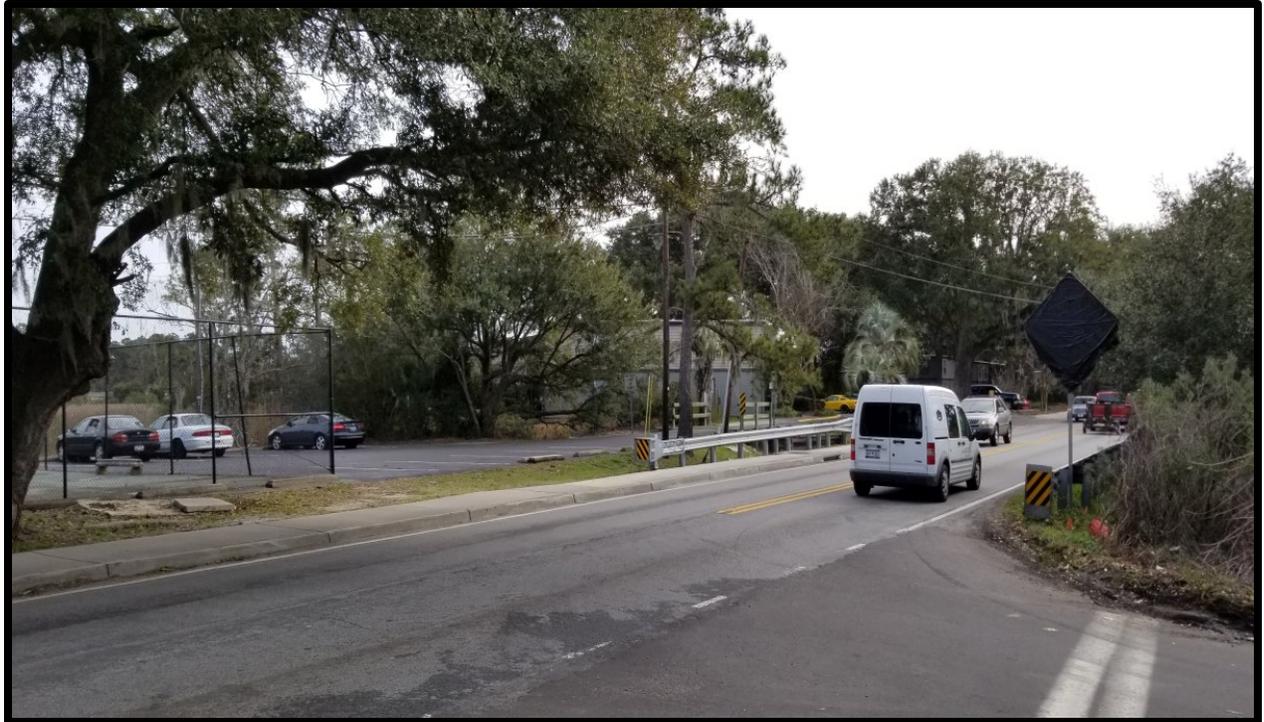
looking southward along Ashley River Road from the intersection with Ashley Crossing Lane
